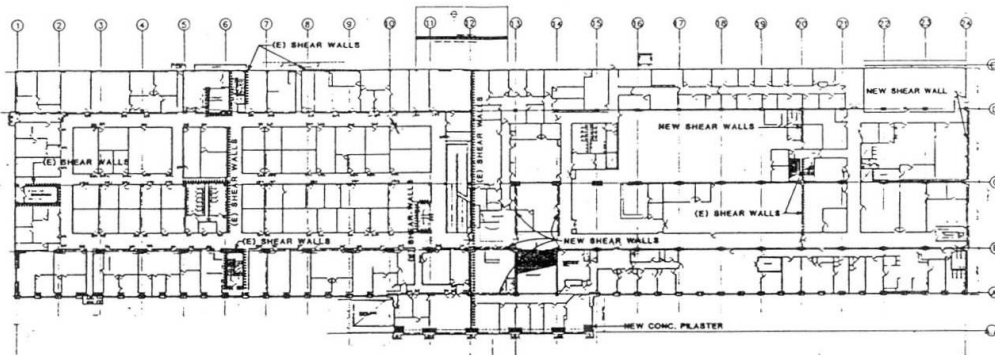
Second Floor of Ferry Building showing existing and recommended locations of shear walls. The tower is between columns 12-13-A-B.
